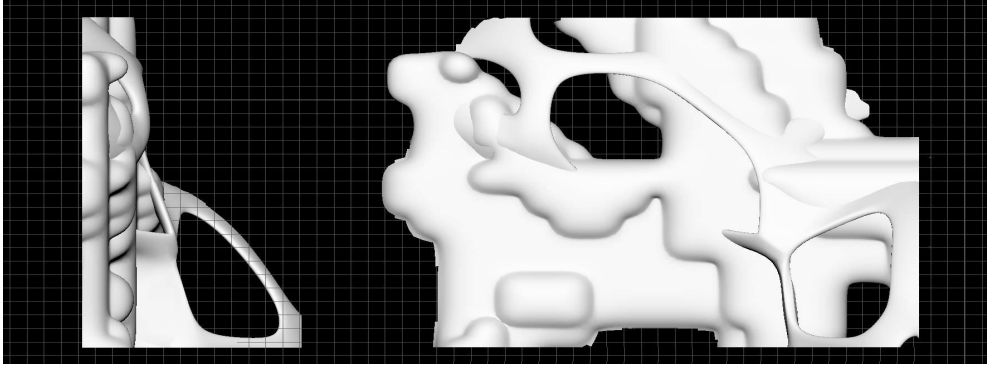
Part of the model (front & side view) sent for physical scale prototyping with concrete/oyster shell composite by combining 3D printing and CNC wax moulding
